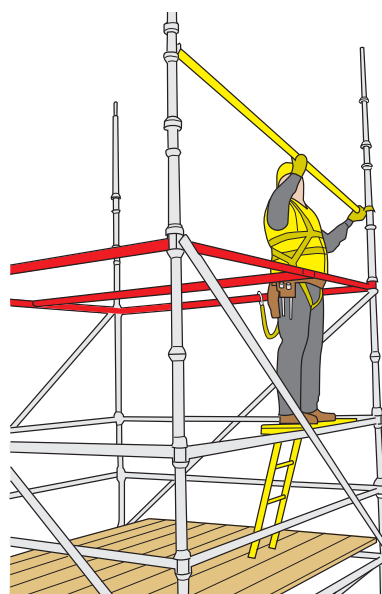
Scaffolder installing a guardrail in advance to the next lift from a scaffolders' step protected by the ledgers and transoms.
